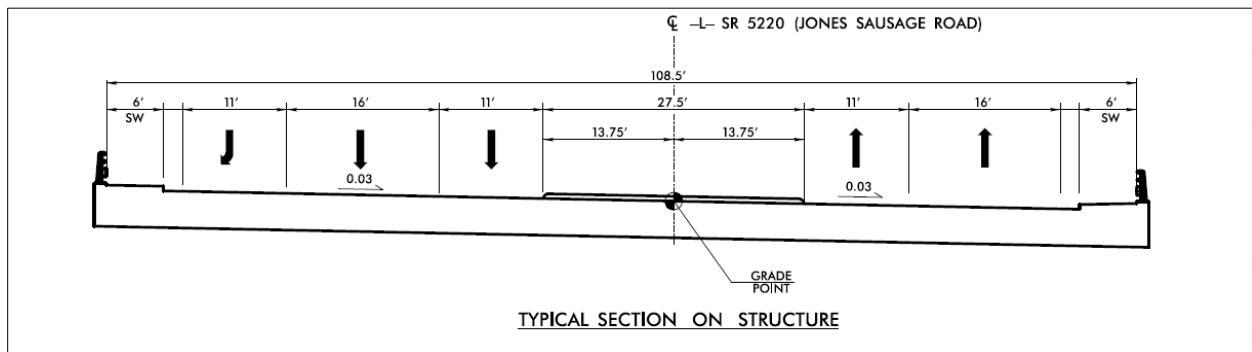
Jones Sausage Road Feasibility Study Structure Typical Section
